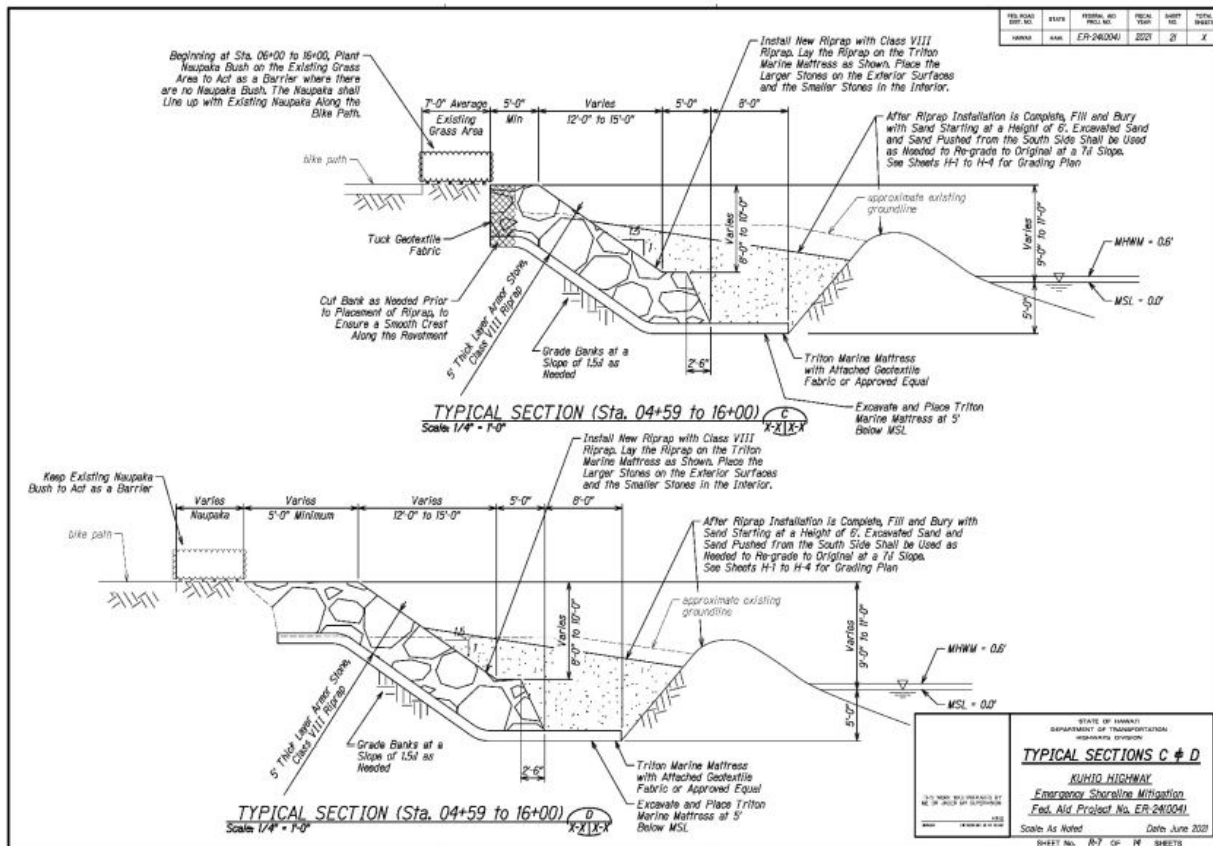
Cross sectional view detailing installation of new ungrouted revetment in Wailuā Beach project area.
